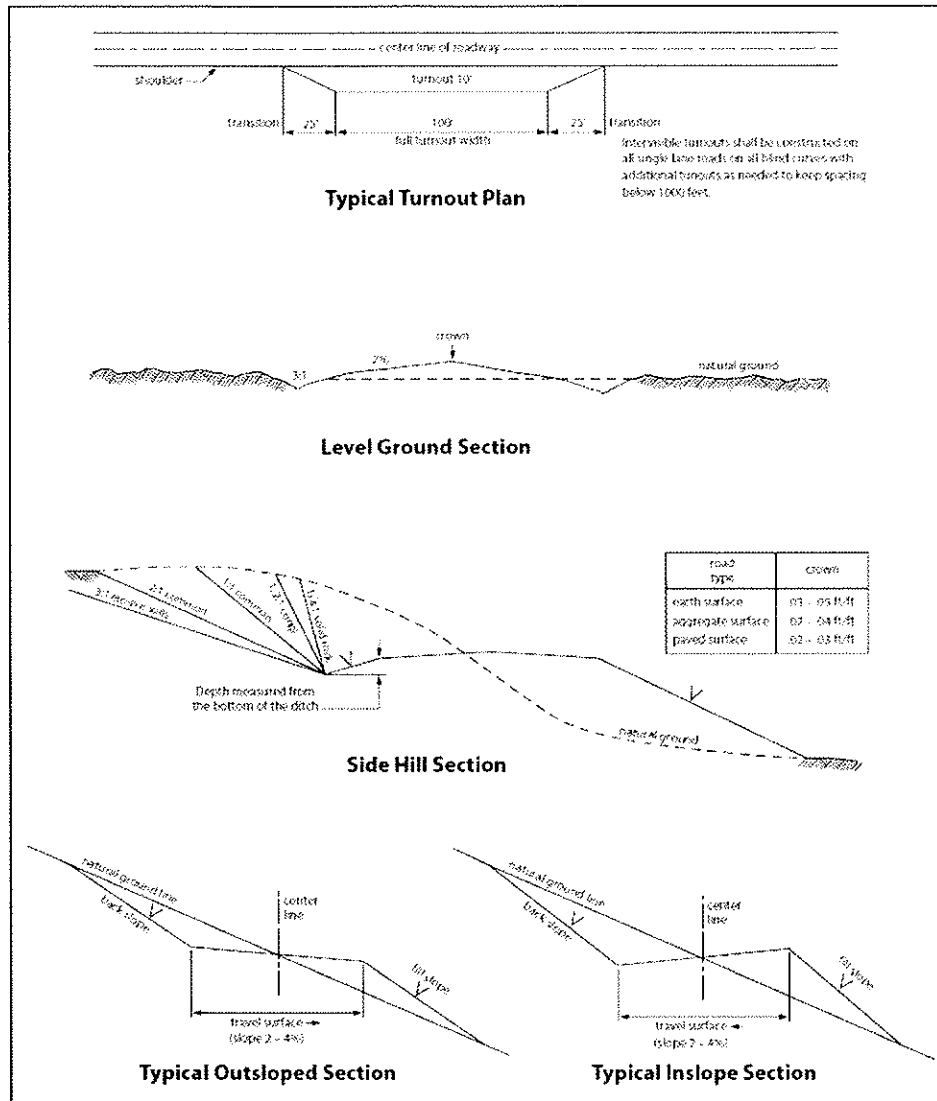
Typical road cross sections (BLM and USFS 2007).
